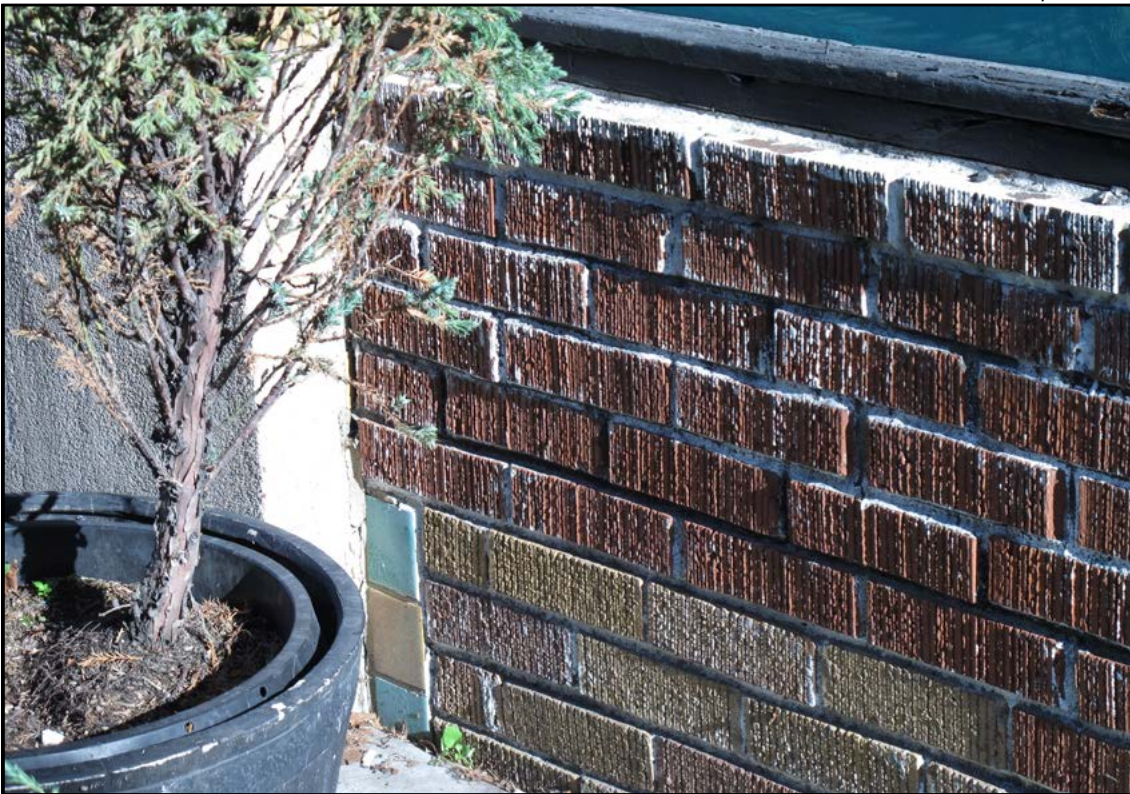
104 Denny Way building, western façade, brick and tile detail
